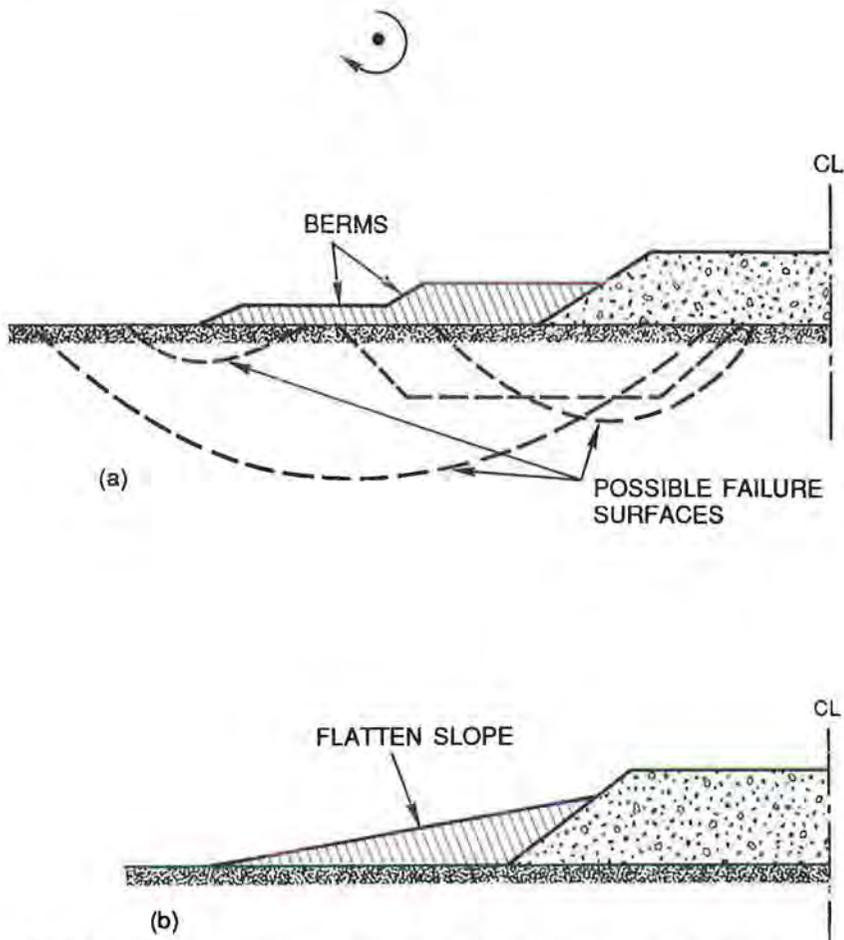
Embankments stabilized with (a) berms or (b) flatten slopes (courtesy *New York State Department of Transportation*).
